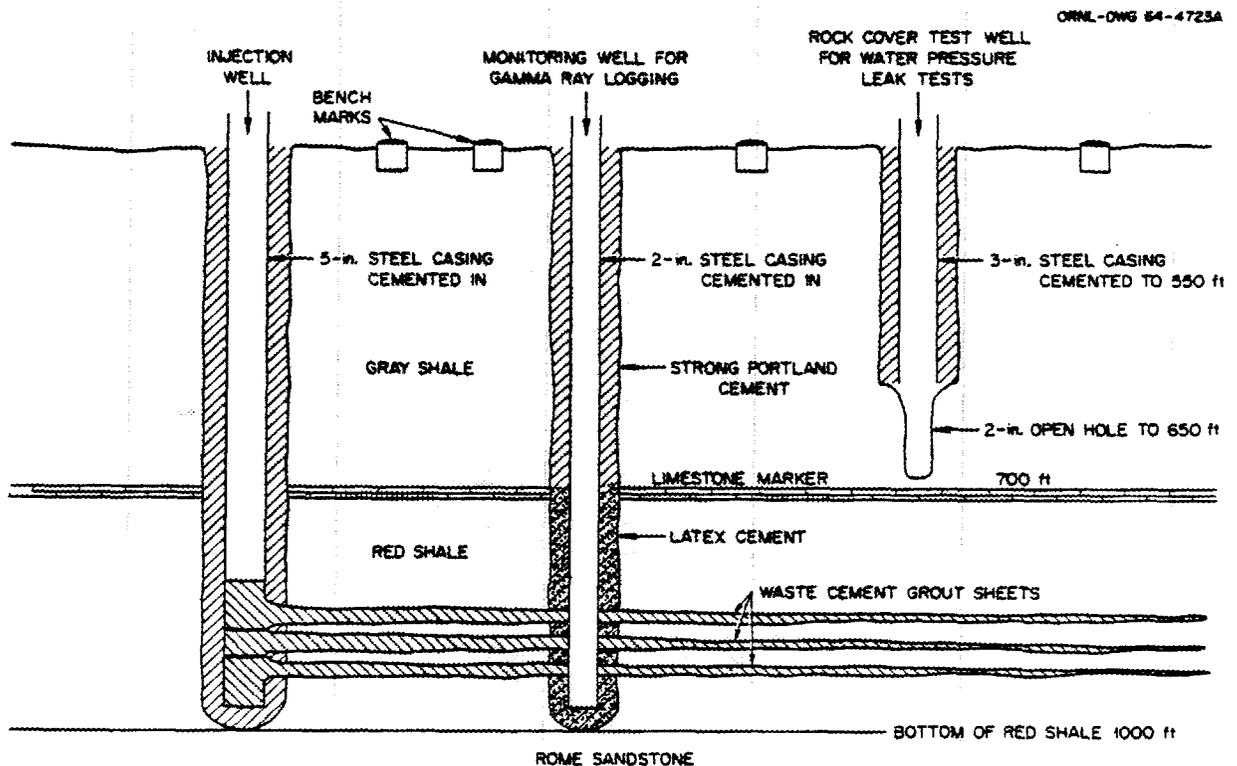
Sketch of Three Types of Wells Constructed at the Fracturing Plant Site.
